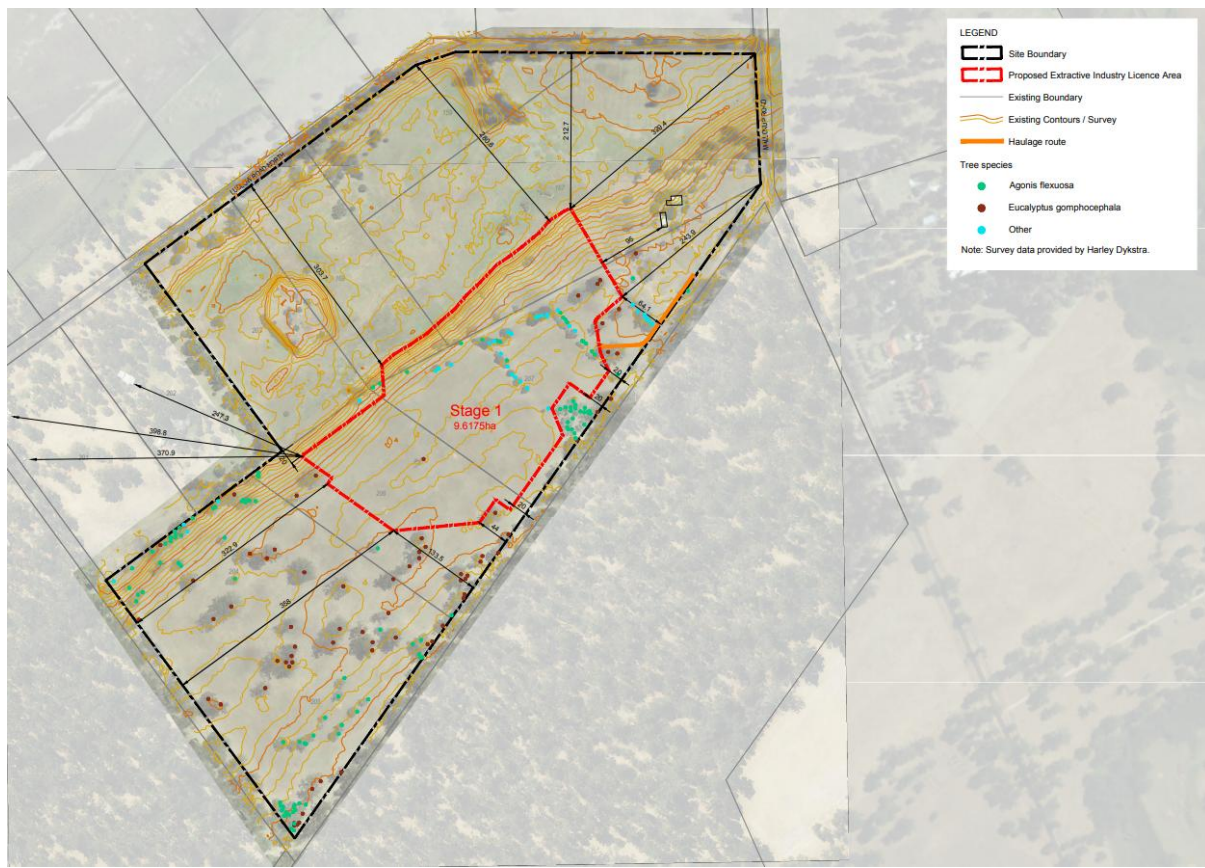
Subject site including vegetation, buildings, topography, proposed extraction area and haulage route
